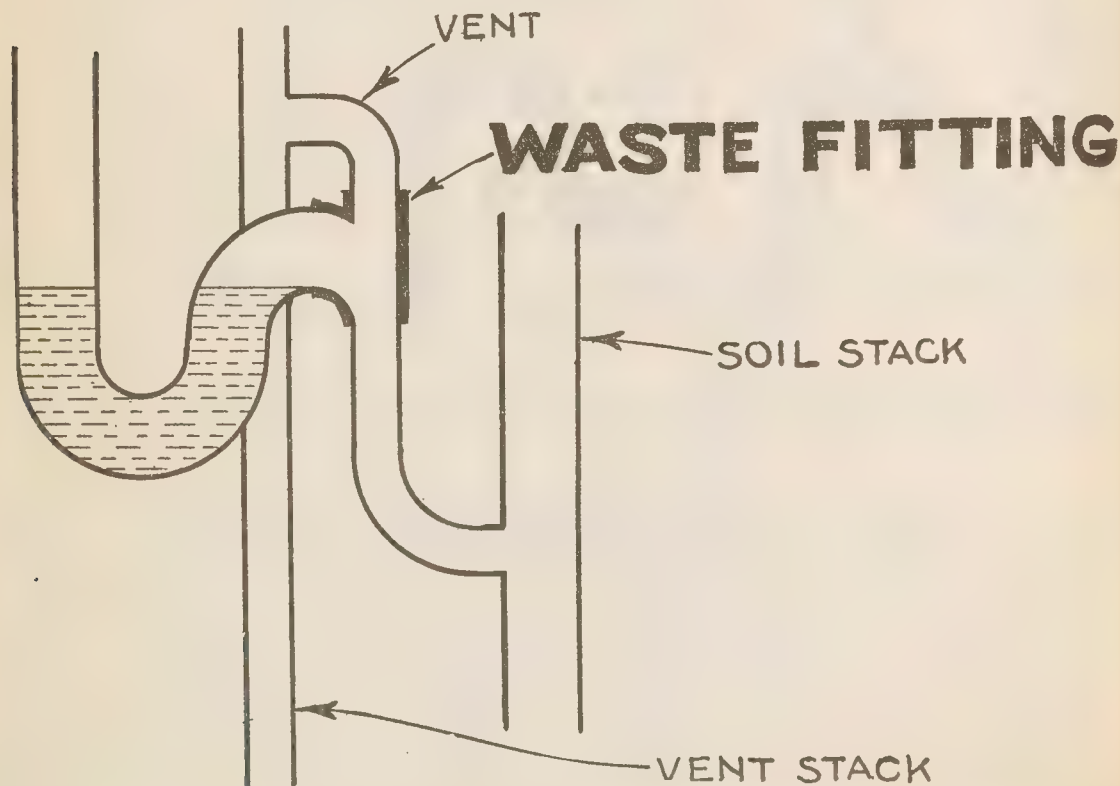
,757.—Continuous venting showing waste fitting, vent and soil stacks and connections.
